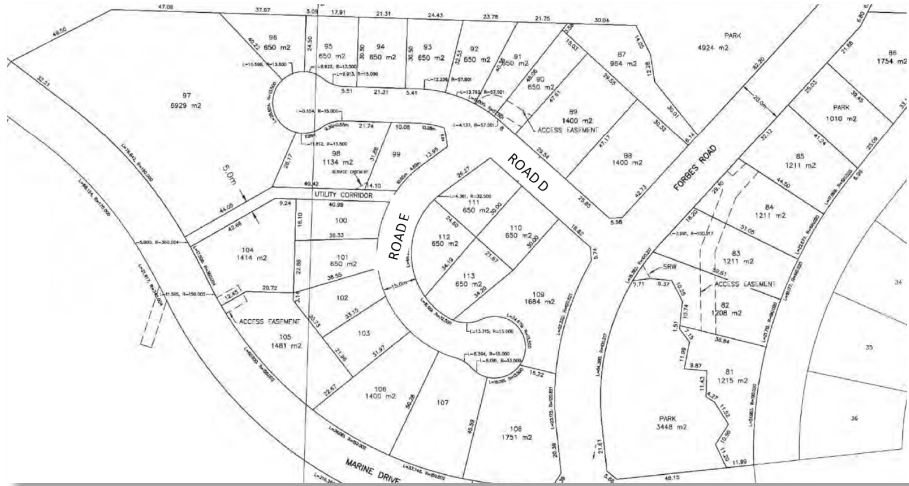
Weyerhaeuser OceanWest phase 5 Subdivision Plan
